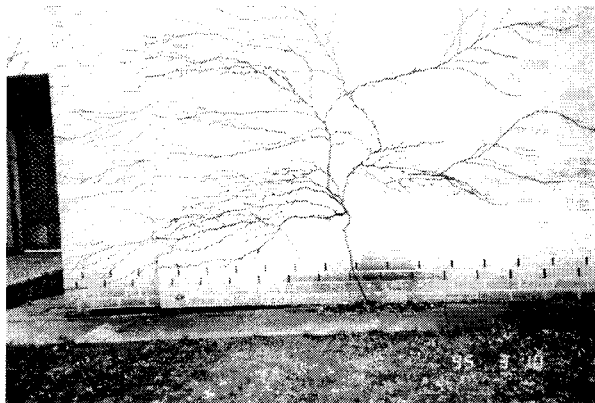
The open vertical joints at the plinth for ventilation of the air gap in the wall
